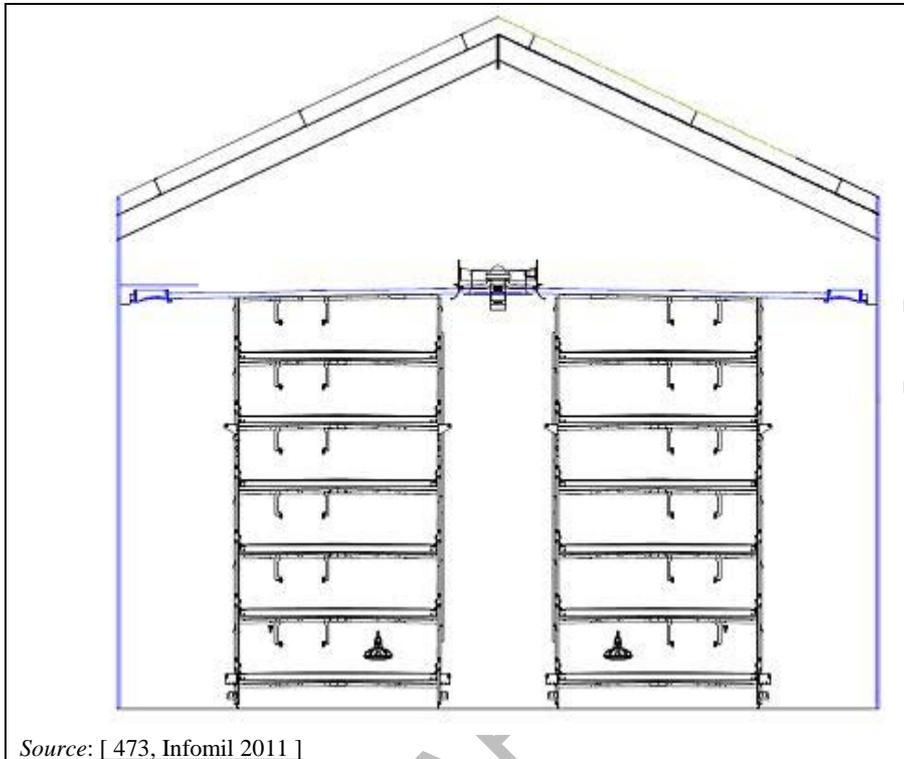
Schematic cross-section and principle of a tiered floor system with forced drying (upward flow) for broilers
